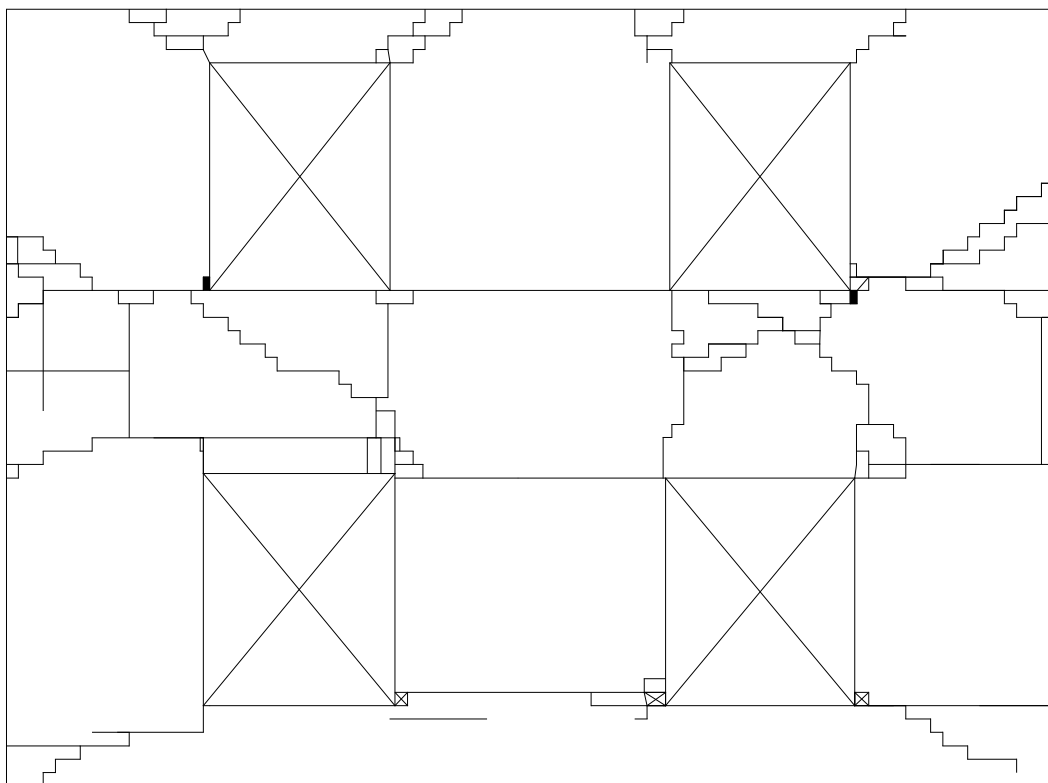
Cracks in Side 1 noted up to the end of Stage G
